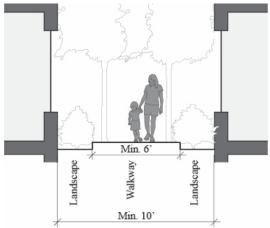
At least 10' wide open space with a minimum of 6'wide walkway.
